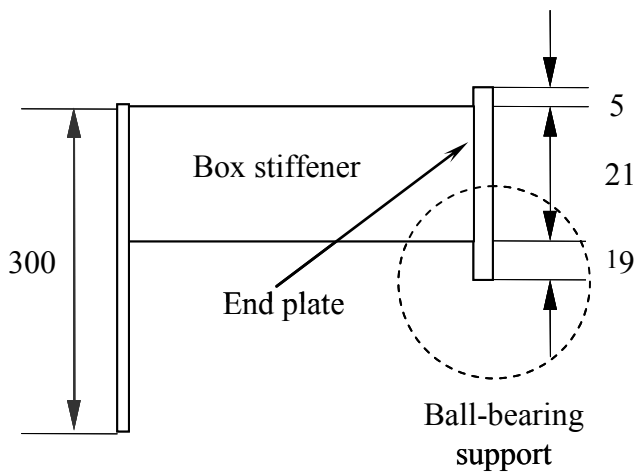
(a) schematically shows the dimensions of the test set-up together with the details of the end supporting, Figure 2-10(b). A slot is machined along the shaft as shown in Figure 2-10 (c) so that the end plate can be fitted into the shaft. Two roller
